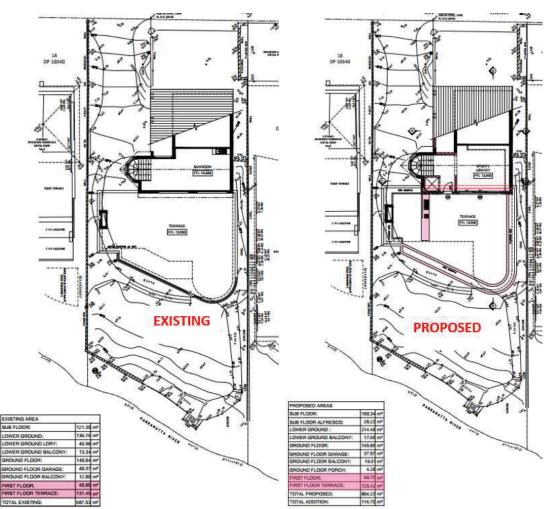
Proposed floor plan changes to first floor level. Source: Architectural Plans prepared by Construction by Design
